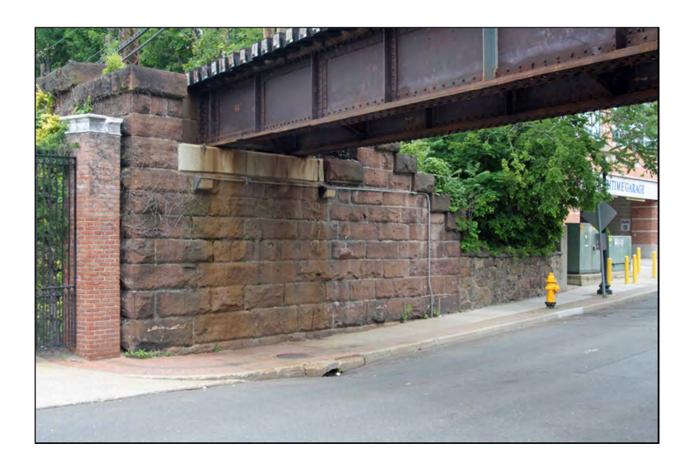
Marshall Street Bridge, detail of stiffener and bottom flange, west side, camera facing east.
